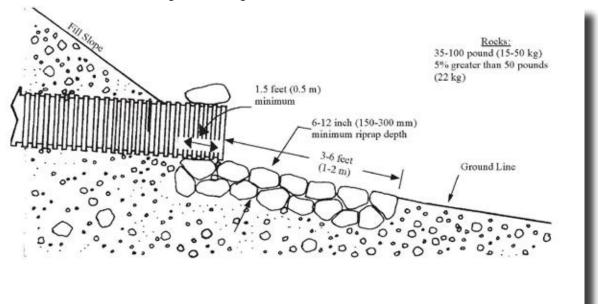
Drawing for riprap pipe outlet protection and slope stabilization.
